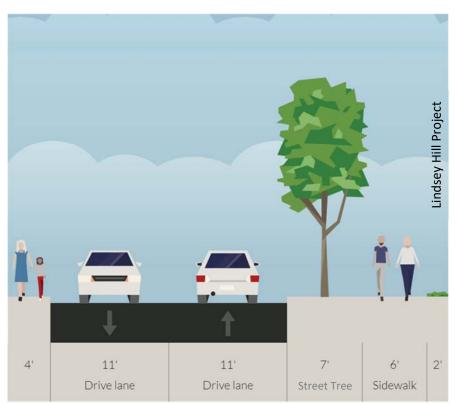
Burleson Street streetscape design concept adjacent to existing gymnasium building.
